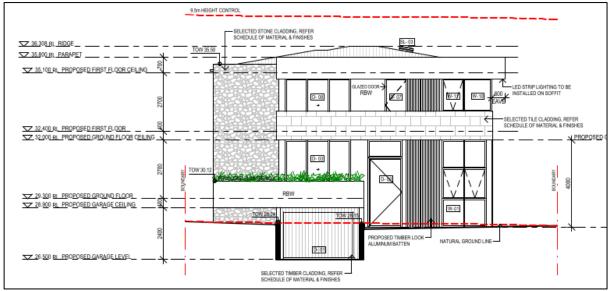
Proposed Northern (front) Elevation to Karuah Street
